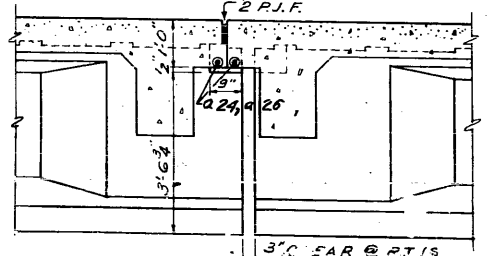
DETAILS OF PRECAST PRESTRESSED CONCRETE I-BEAMS GRADE SEPARATION U.S. ROUTE 66
